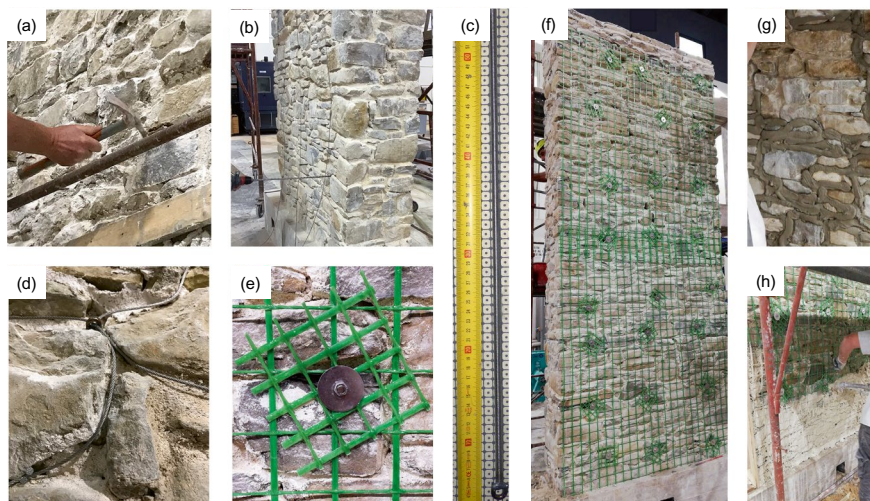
Prototype reinforced with CR system. Work steps: removal of mortar from the joints of the exterior side (a); drilling for connector insertion (b); stainless steel connector detail (c); stainless steel cords placed in the mortar joints (d); GFRP mesh laid on the interior side (e); detail of connector anchorage on the GFRP mesh (f); repointing of the mortar joints of the exterior side with embedded steel strands (g); machine application of heat-insulating mortar on the GFRP mesh of the interior side (h)
